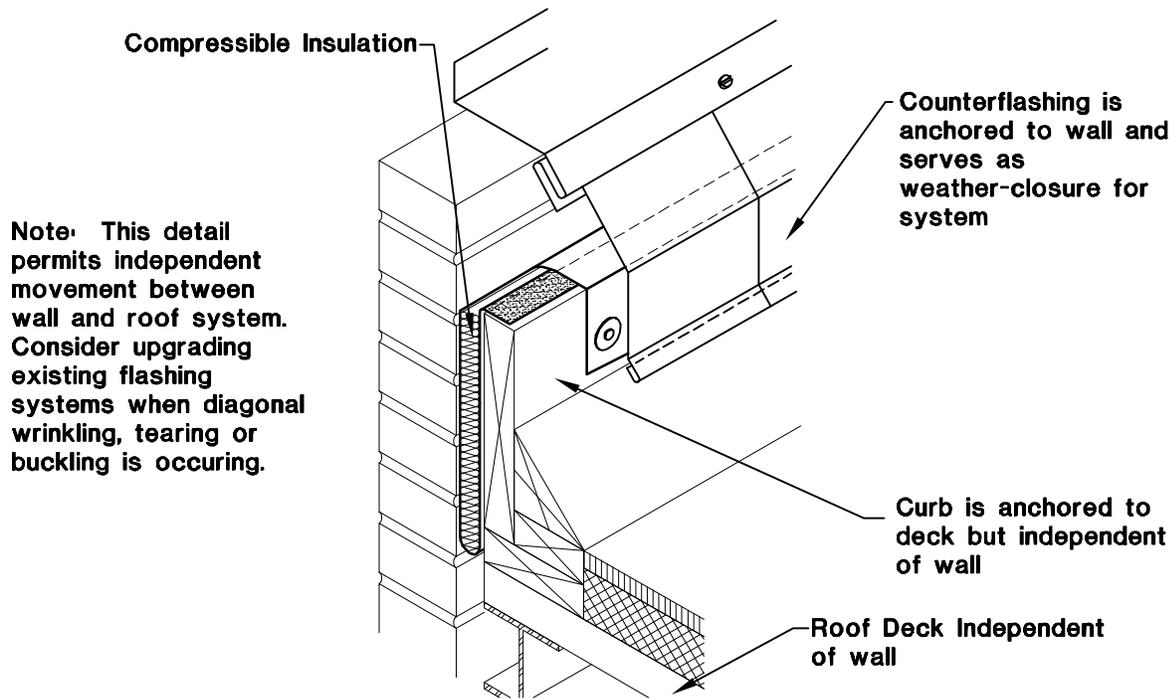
Use of Curb for Base Flashing, Independent of Wall Movement
